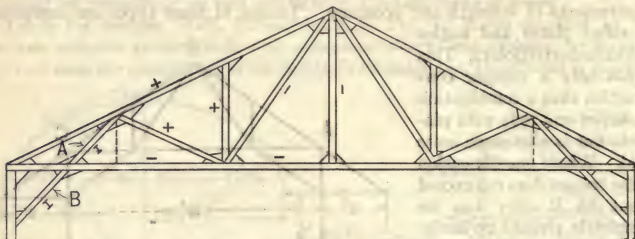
Fan Truss with Knee-braces. Spans from Forty to Sixty Feet
